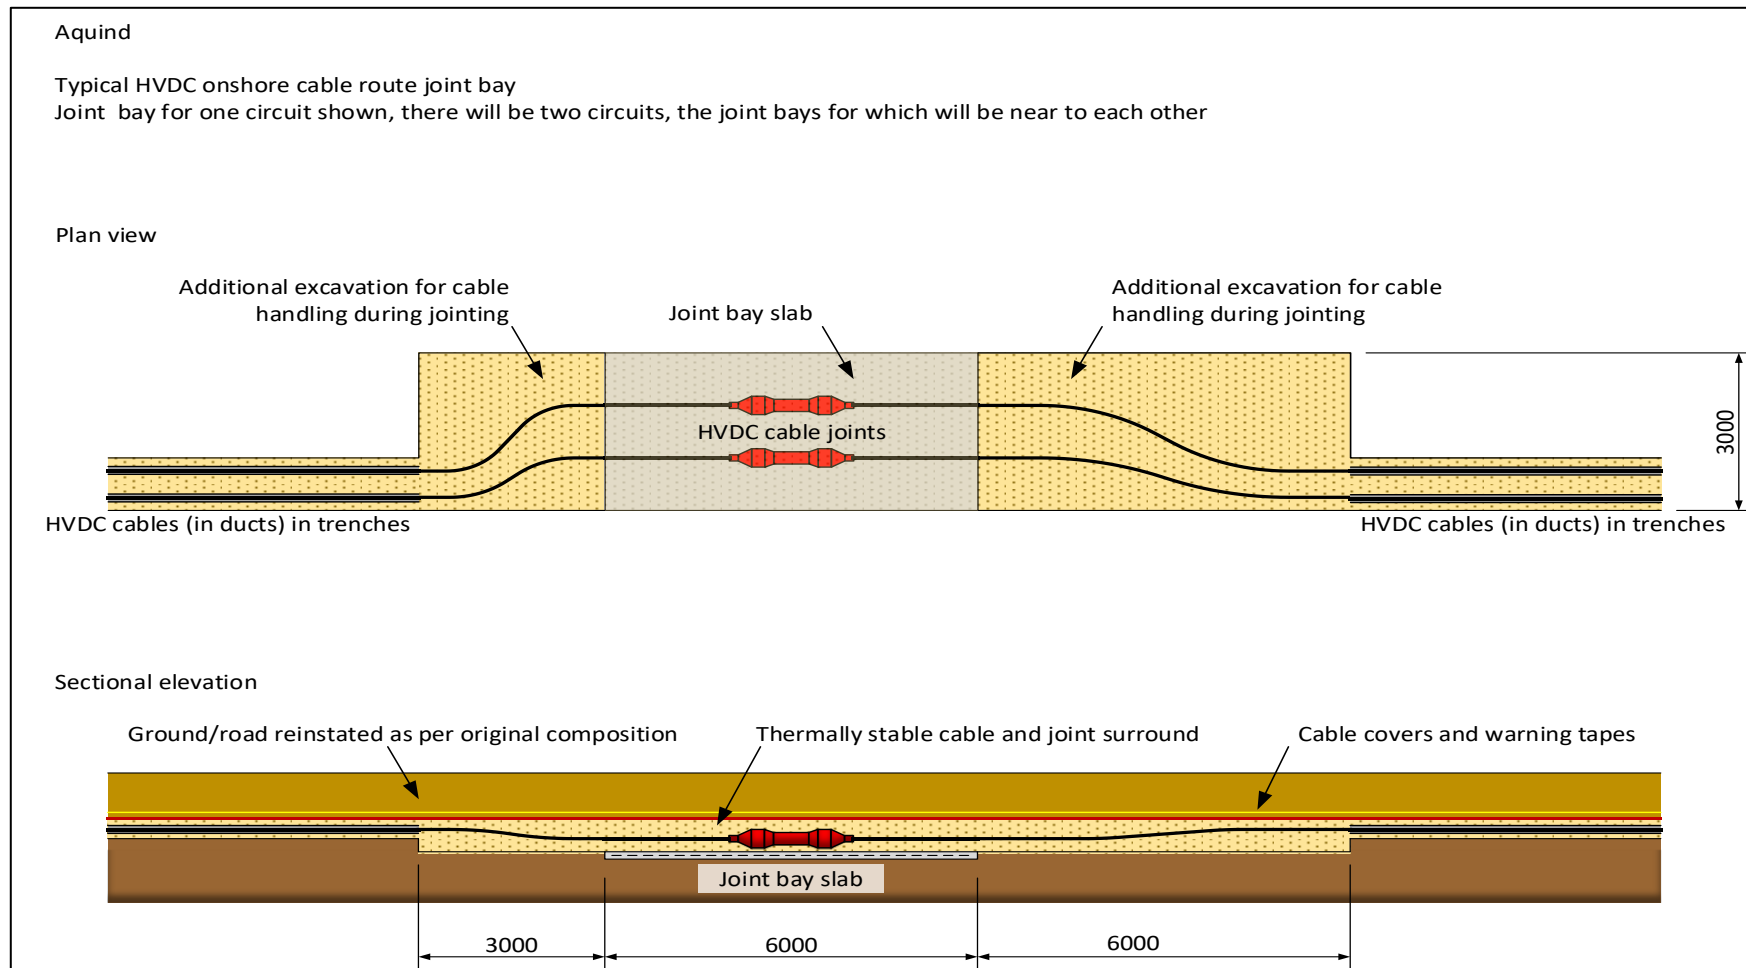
Typical Schematic of Joint Bay (distances in millimetres)
